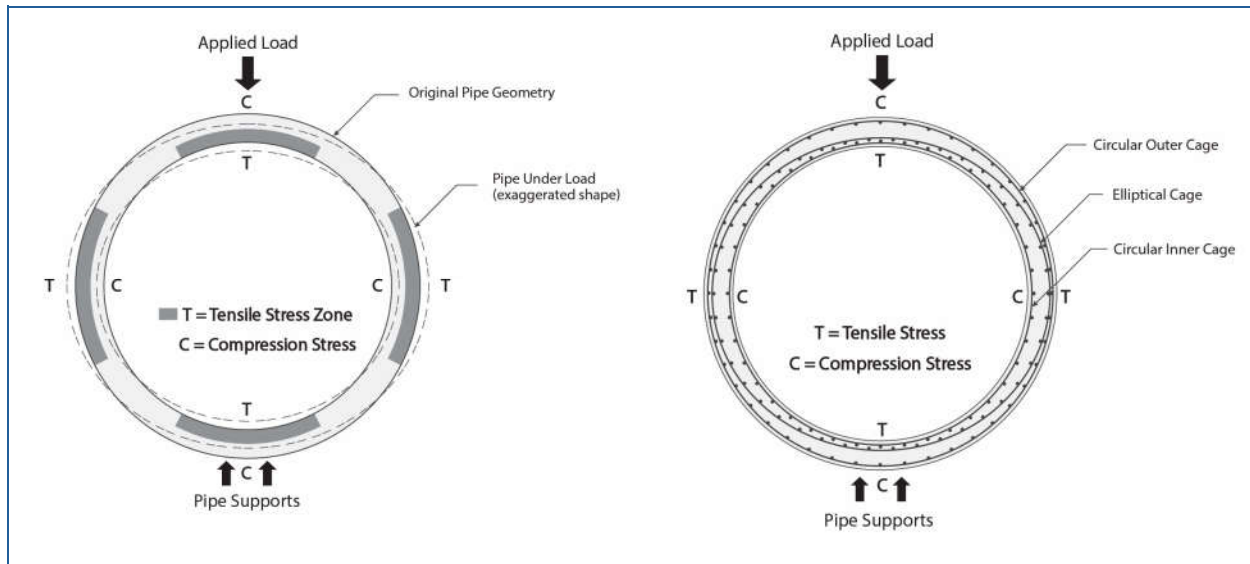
Flexural Stress on Loaded Concrete Pipe and Reinforcing Requirements
